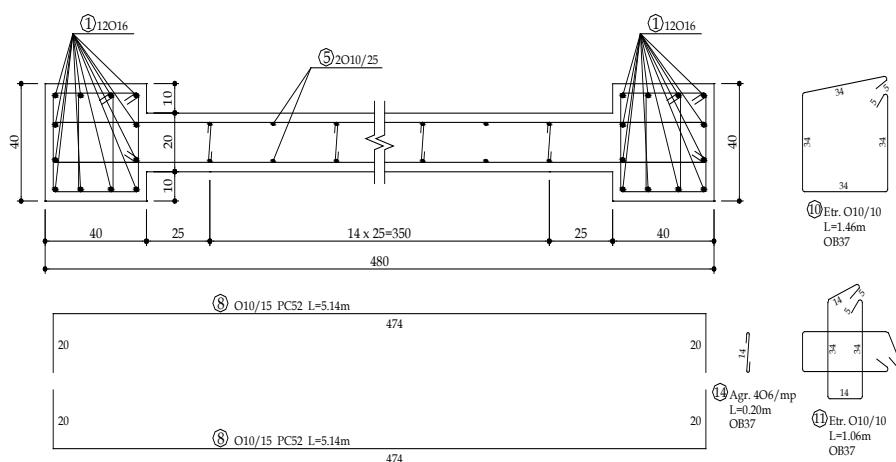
Section based on the ground floor concrete wall insulated X, Ax F
